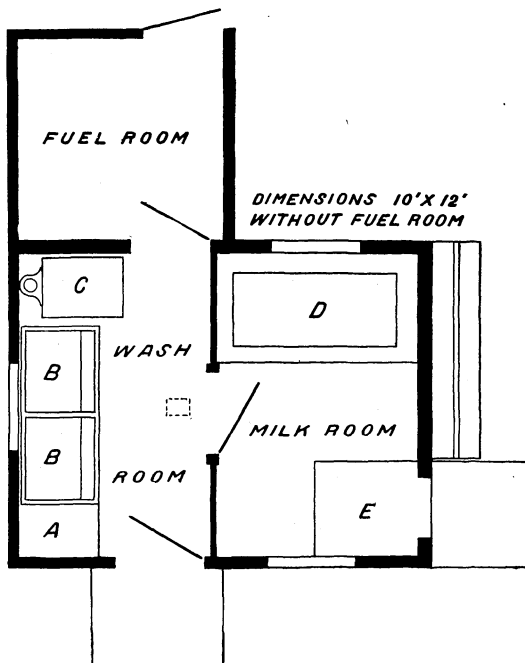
Floor plan of small dairy house suitable for dairy of 20 cows.
